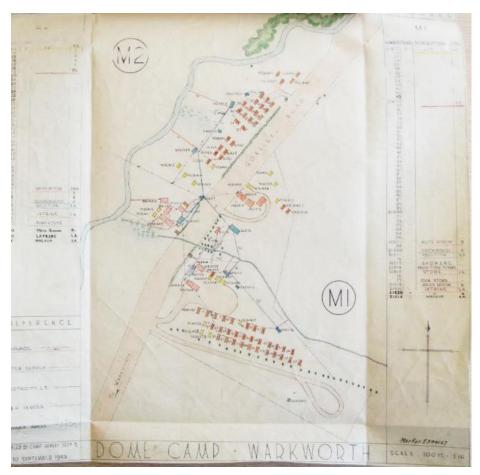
Camp plans of M1 and M2 (source: Camp Data – Archives NZ)
